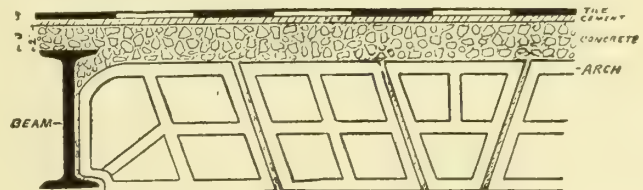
TILE ON IRON BEAMS AND HOLLOW TILE ARCH
